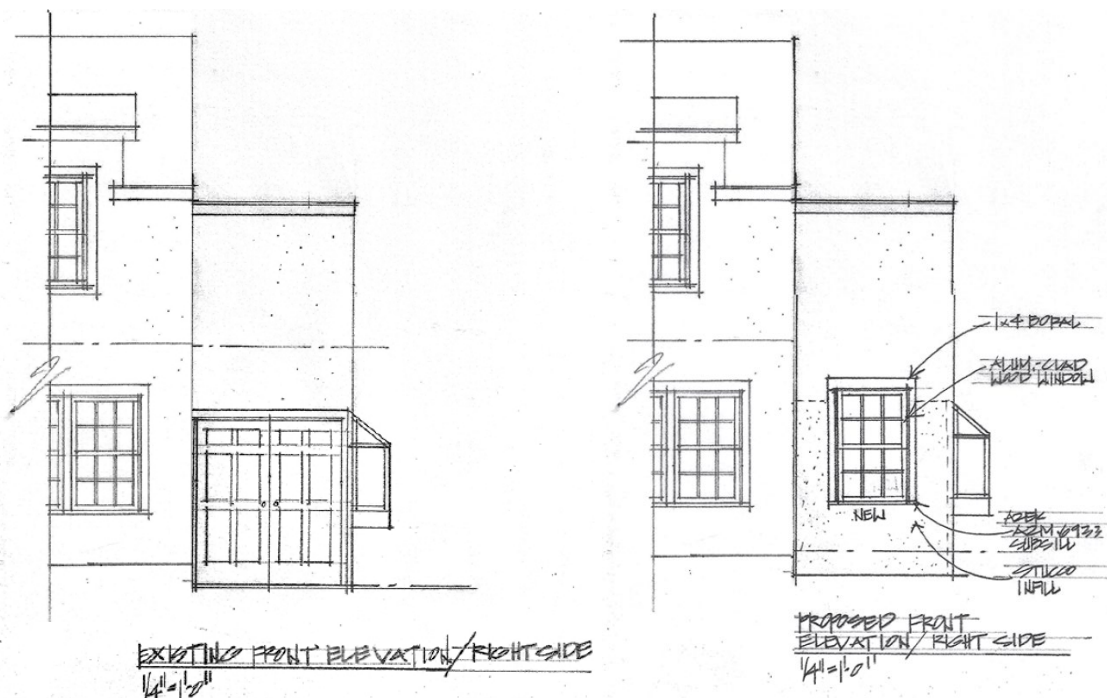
Partial existing and proposed front elevations showing the modifications to the existing street-facing doors on the non-historic rear addition.
